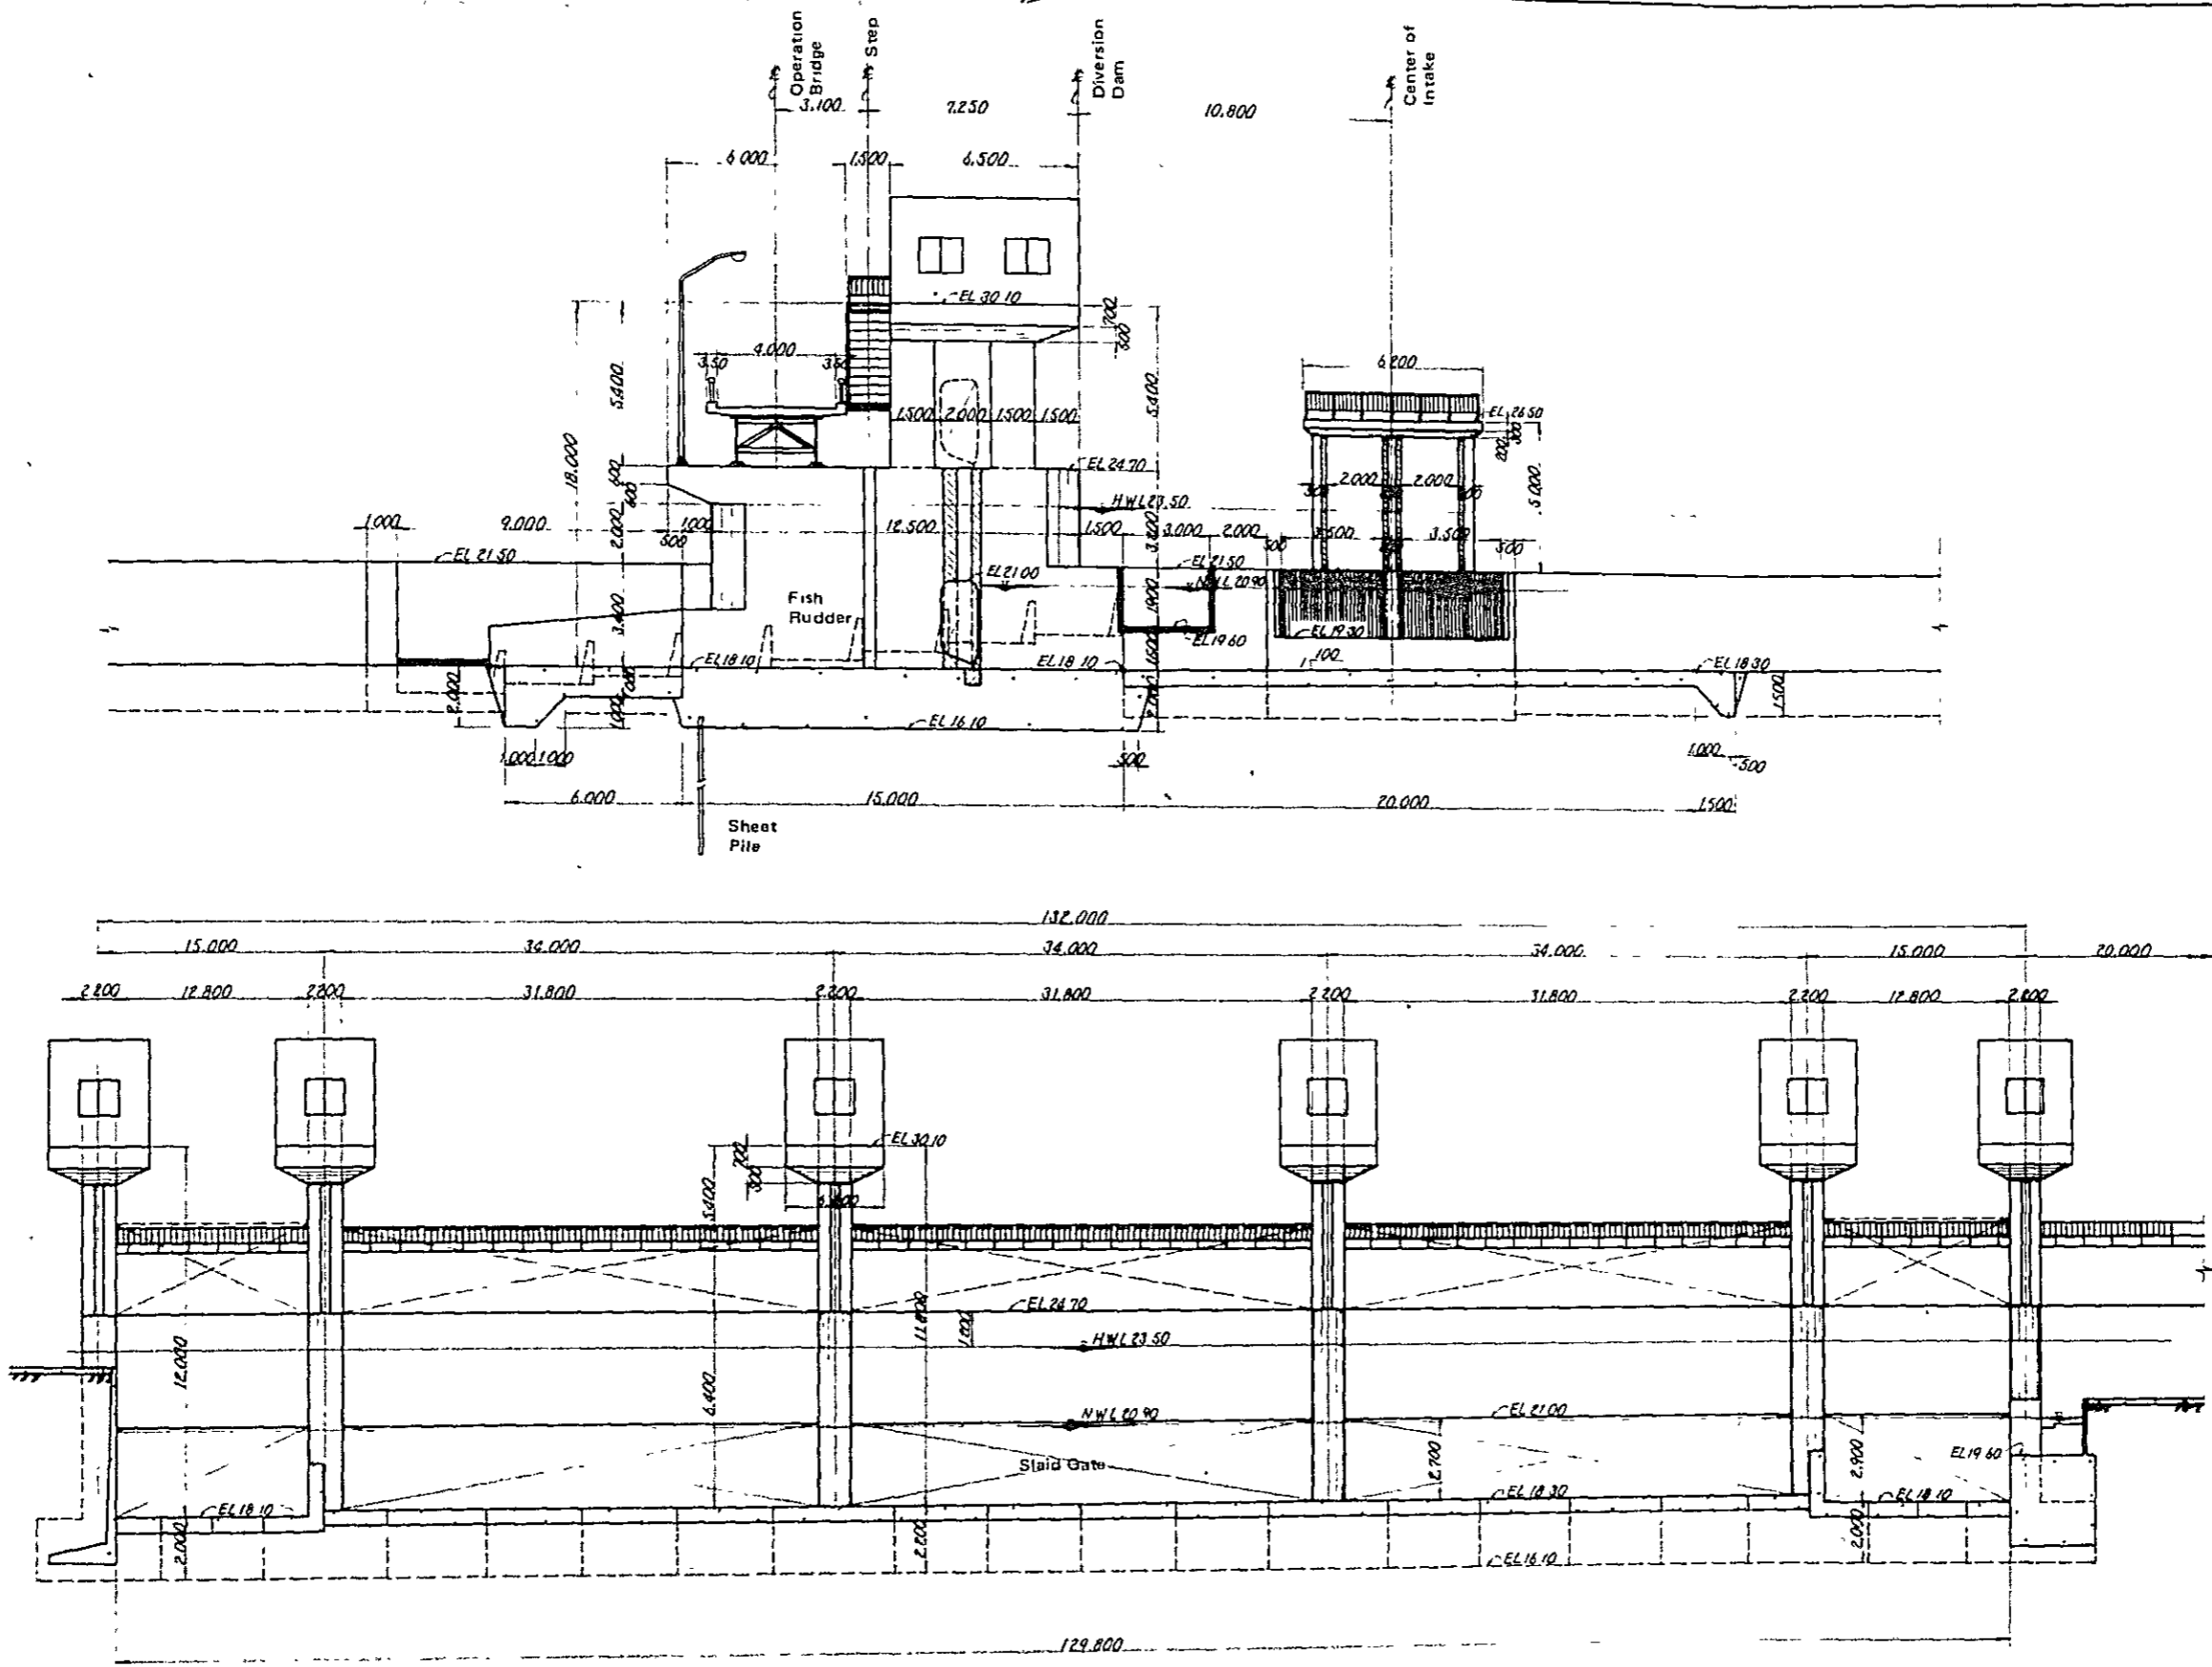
TYPICAL PLAN OF INTAKE AND SPILL WAY
